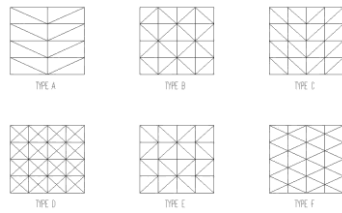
Different types of bracing system adopted in steel frame folded plate roofing.
